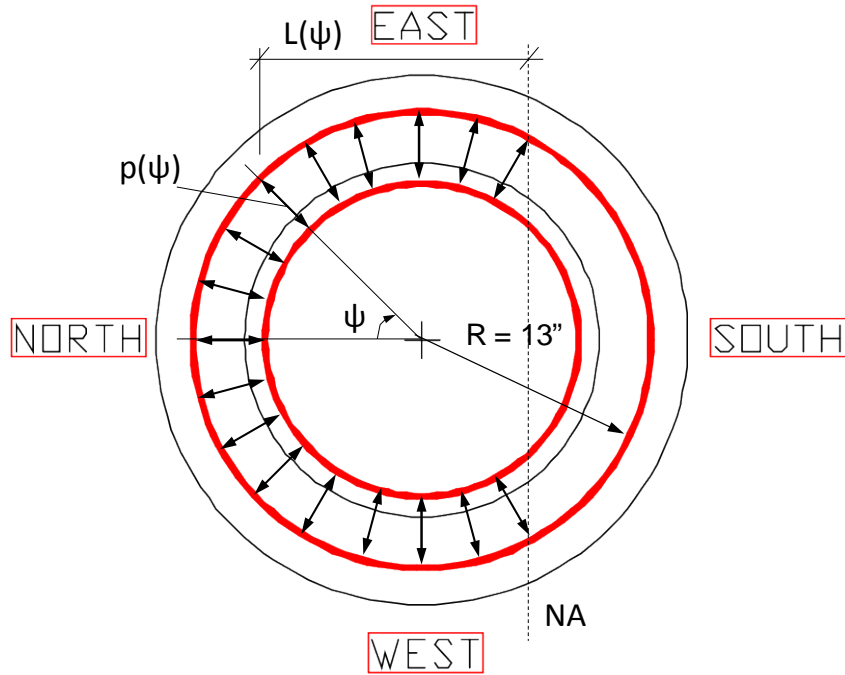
Diagram. Tension transfer from column to shaft longitudinal reinforcement.
